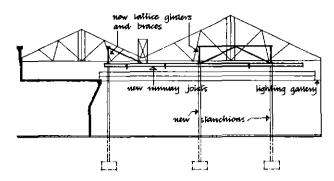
Diagrammatic section showing method of supporting runway joists and motorized lighting equipment
